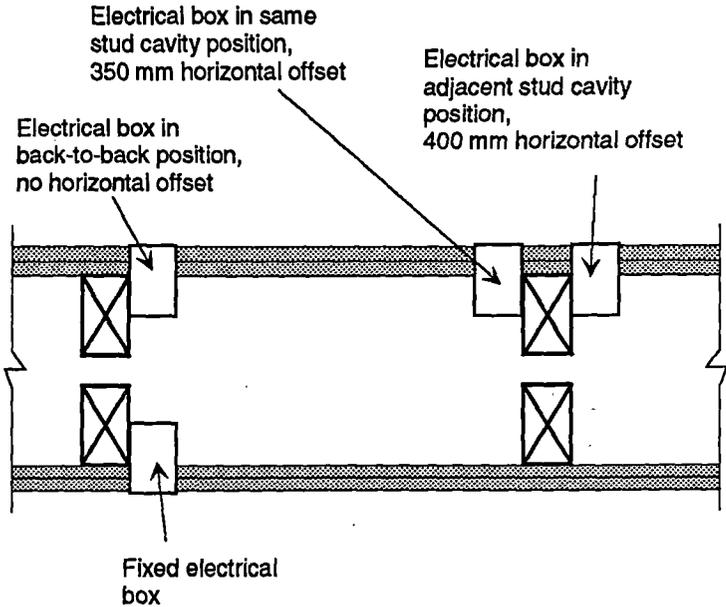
(b): Positions of the electrical boxes in the double stud wall. This construction was the same as in Figure 1(a), but with 90 mm glass fibre batt displaced around the electrical boxes in the stud cavity (see also Fig.4).
